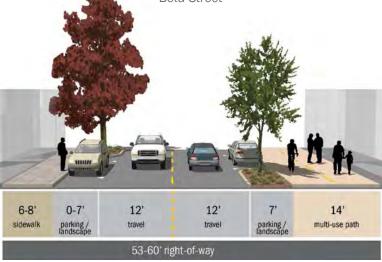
Conceptual Cross-Section for Main Street North of Beta Street
